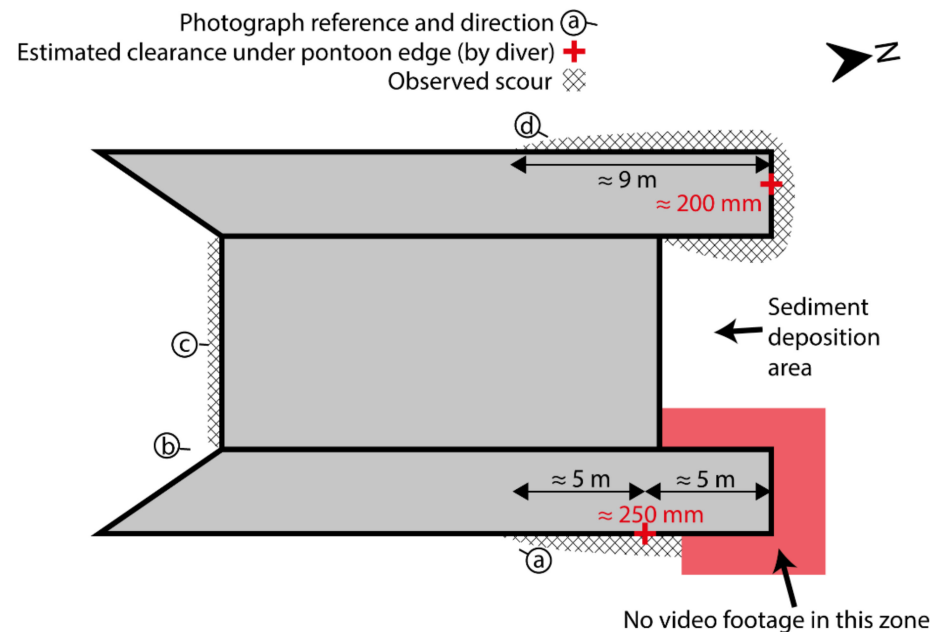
Plan sketch of observed scour around the OWC WEC at Location 1 on 10 January 2021. Not to scale.
